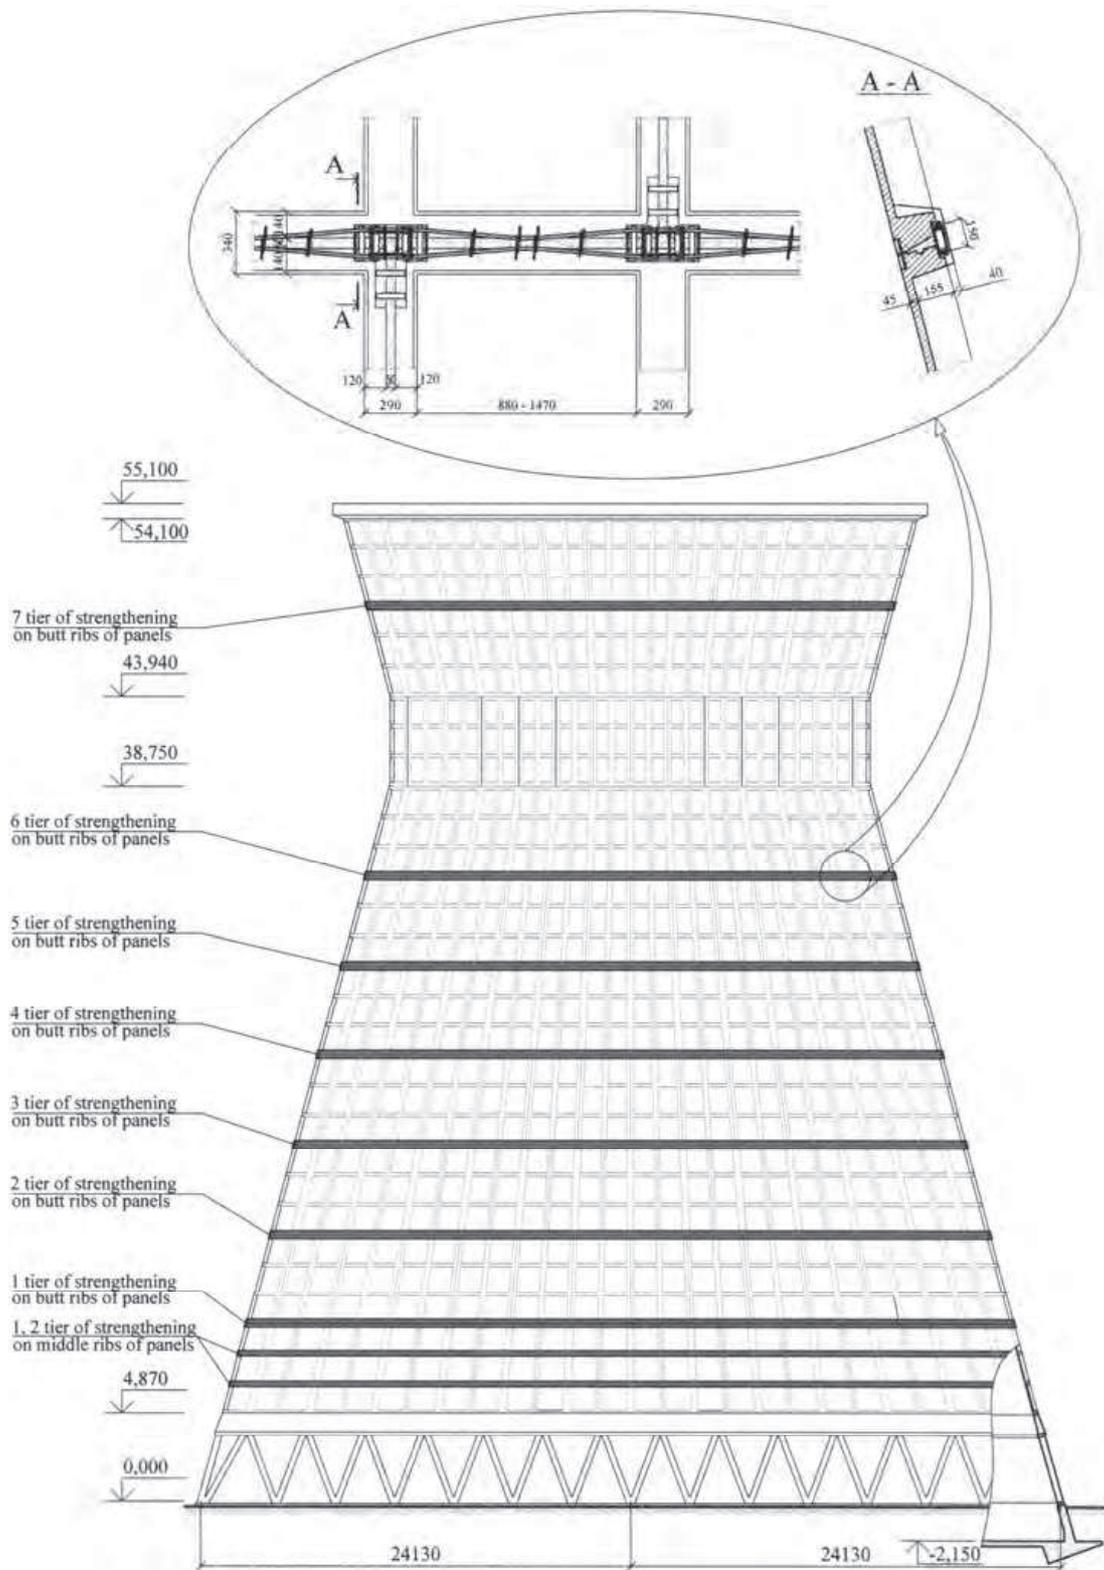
The storeys of strengthening the horizontal ribs of precast reinforced concrete panels of cooling tower shell by prestressed ring armature
